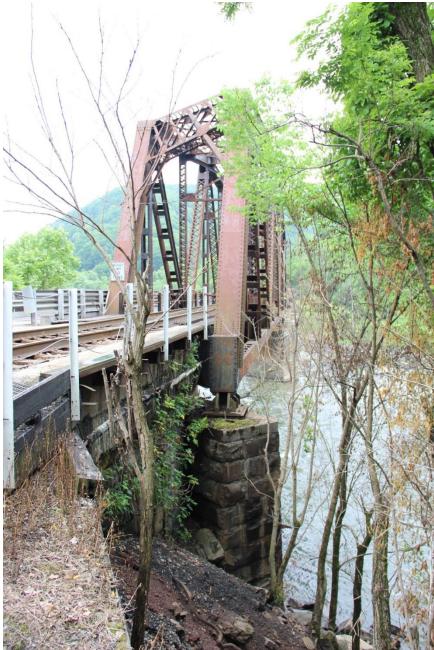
SUBSTRUCTURE UNIT: NORTH STONE ABUTMENT (CA. 1890) AND SUPERSTRUCTURE UNIT: WARREN TRUSS SPAN ONE SHOWING NORTH PORTAL, FACING SOUTHEAST.
